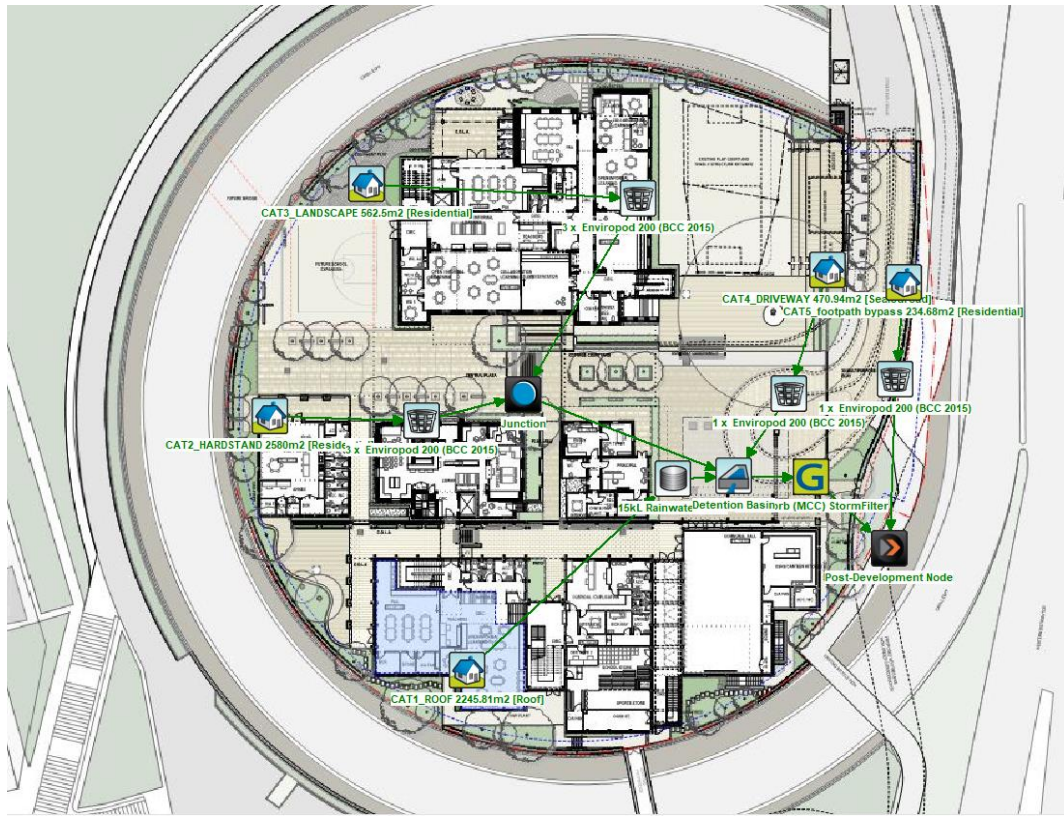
MUSIC Modelling Layout (Based on Architectural Plan Issued 06.12.2019)
